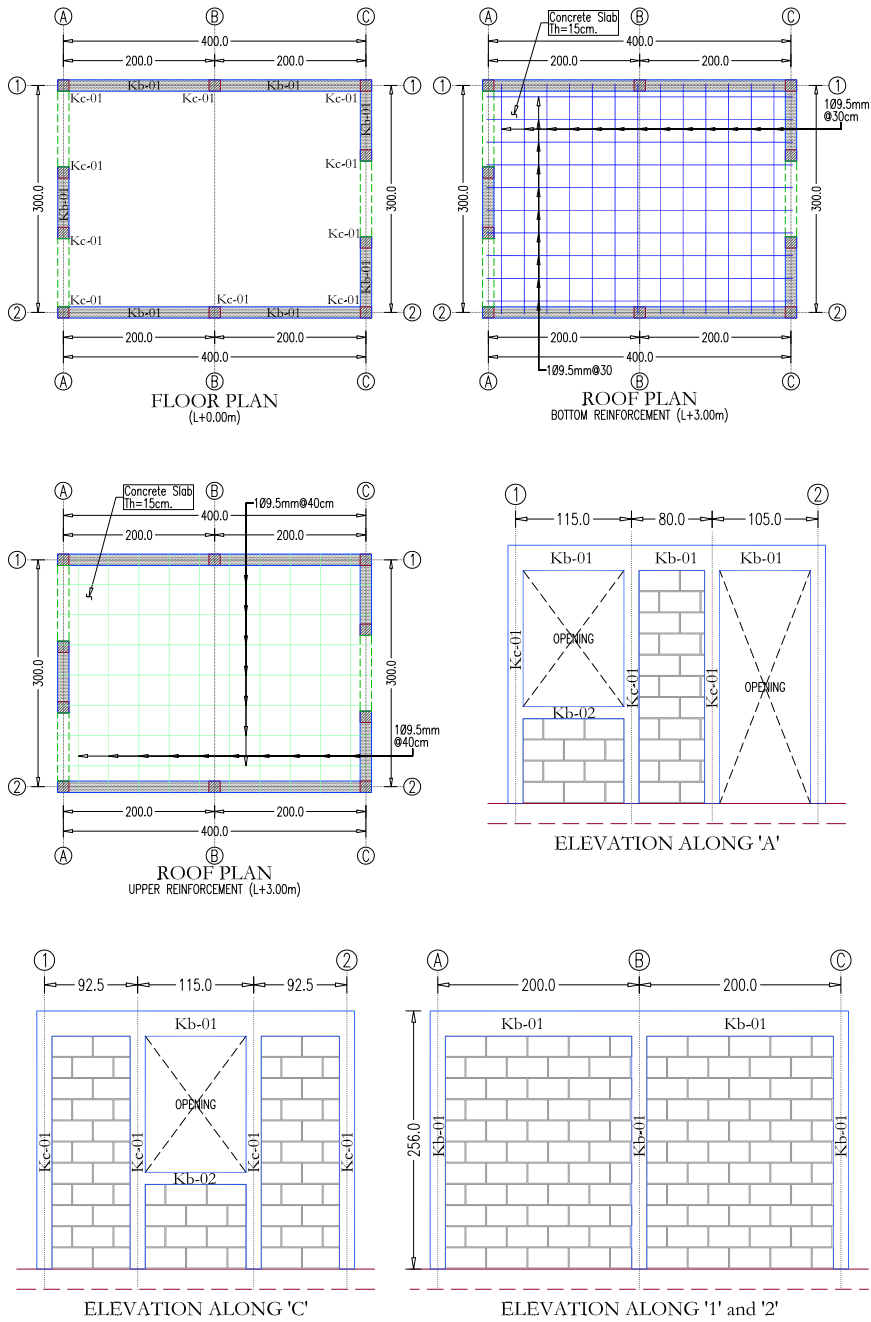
Structural Drawings - One storey construction (units: cm).
